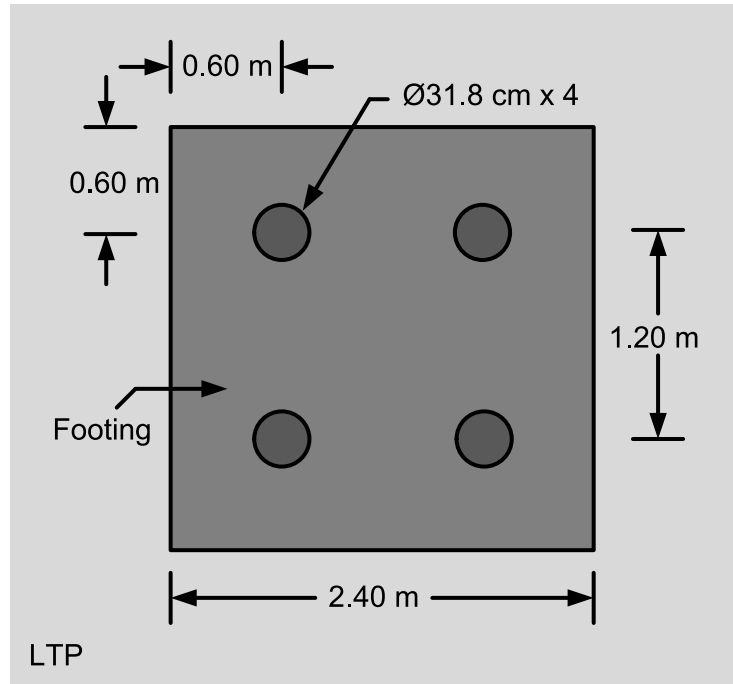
Plan view of the stiff column-supported footing. Prototype-scale system (not to scale).
